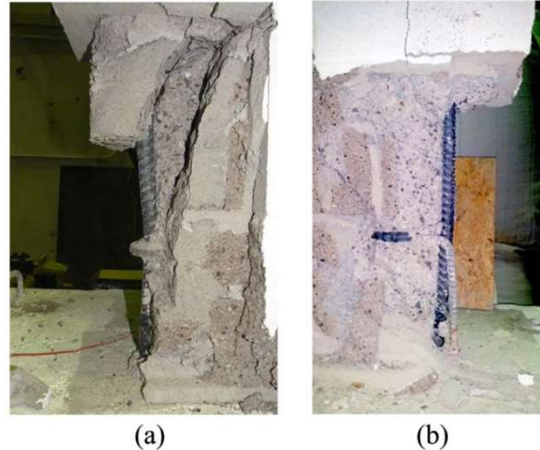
In-plane lateral confinement of vertical reinforcement using: (a) 180° hook; (b) 90° hook anchorage end detail.
